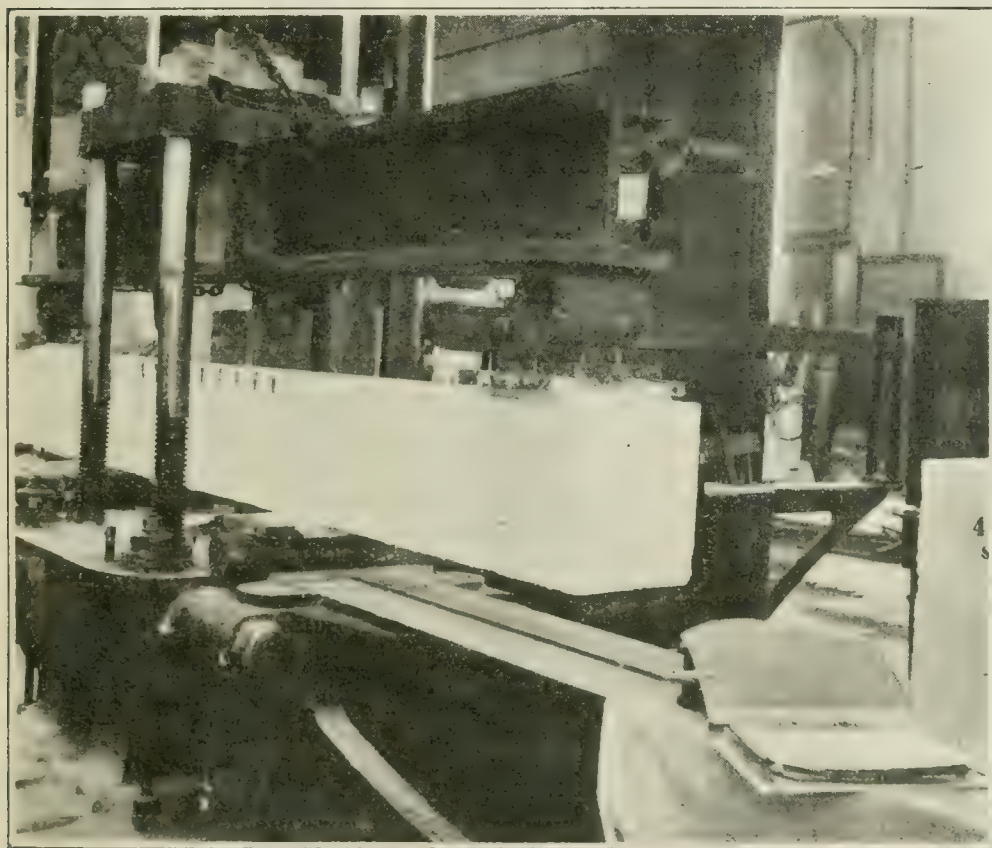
VIEW OF BEAM WITH LAPPED BARS IN TESTING MACHINE.
